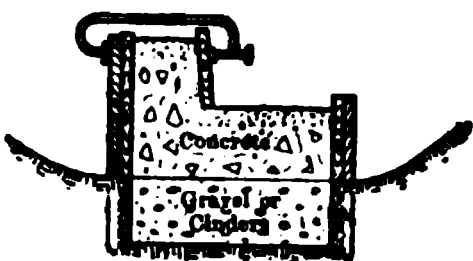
Wooden Forms for Cement-Concrete Curb and Gutter
